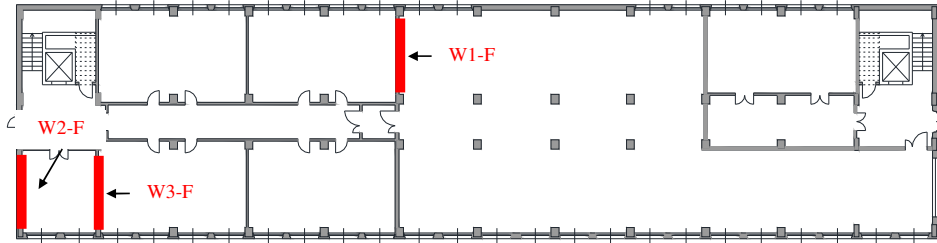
Layout of the tested infill masonry walls at the underground level of Building 1.
